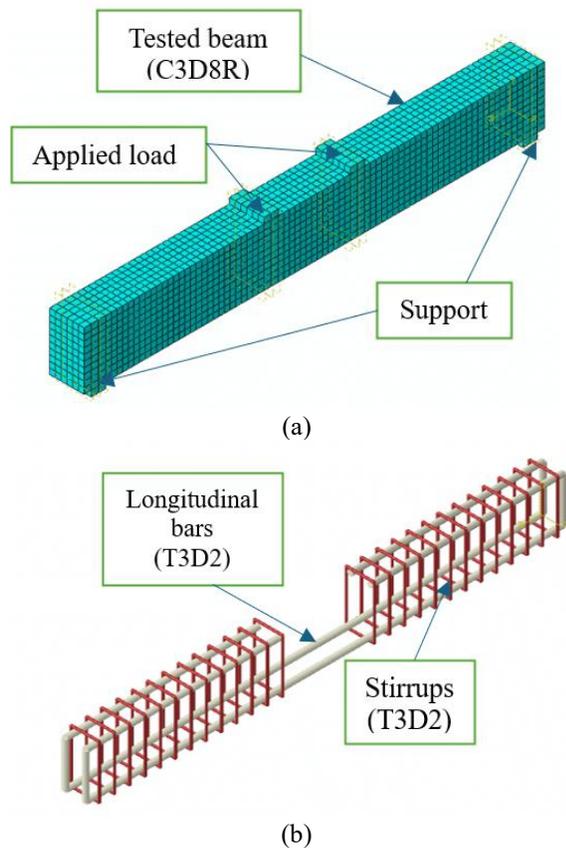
Model set-up of Atta et al. [12]: (a) Concrete elements type, loading, and boundary condition, and (b) Types of steel elements.
